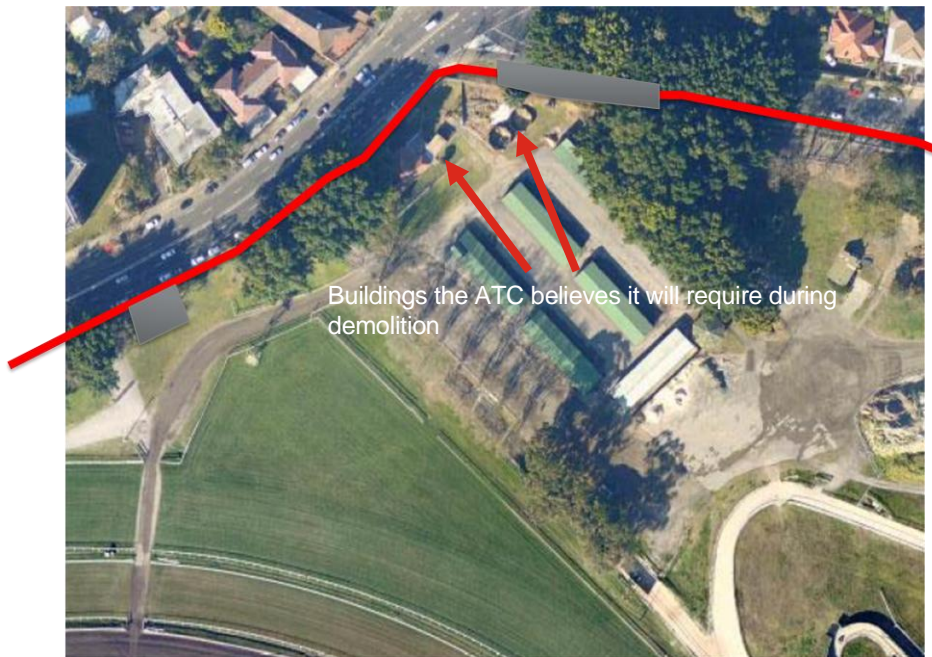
Aerial Image of location for the new stabling complex and indicative light rail impact
